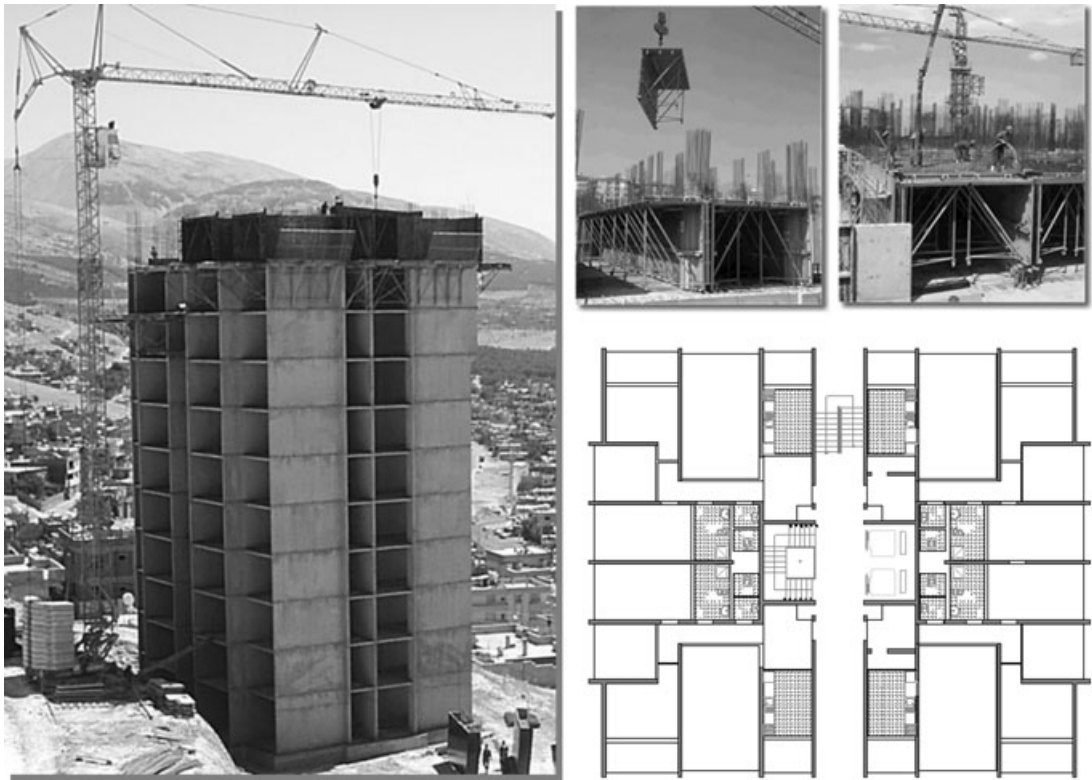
Multistory tunnel building construction system and typical symmetrical story plan. Note: thick lines in plan indicate shear walls
